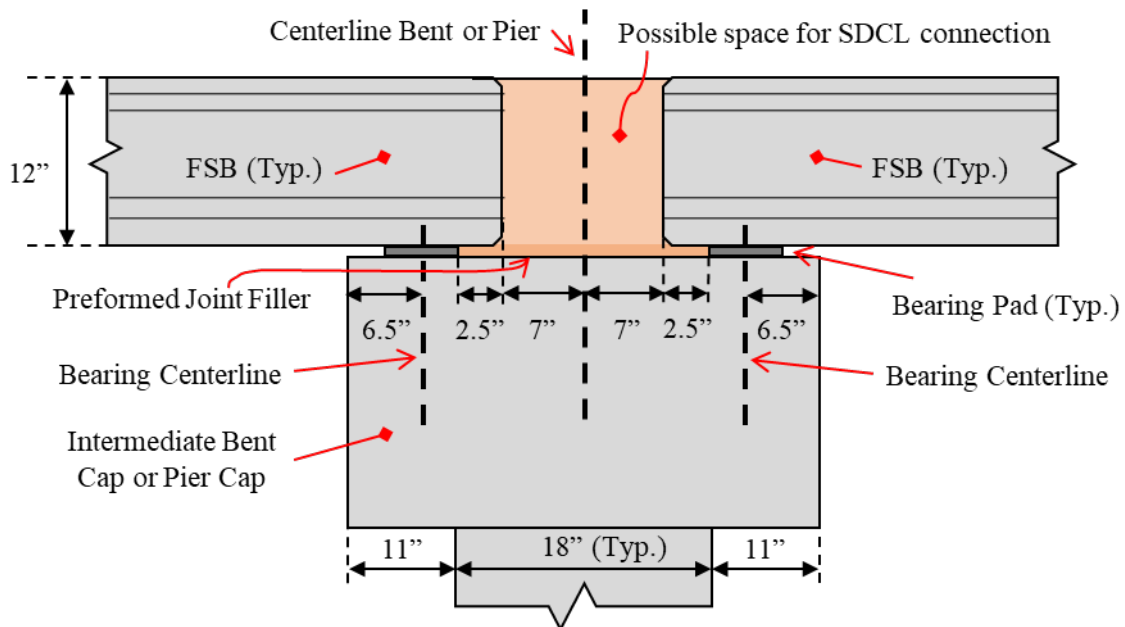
Modified FSB detail without CIP deck at intermediate bents or piers
